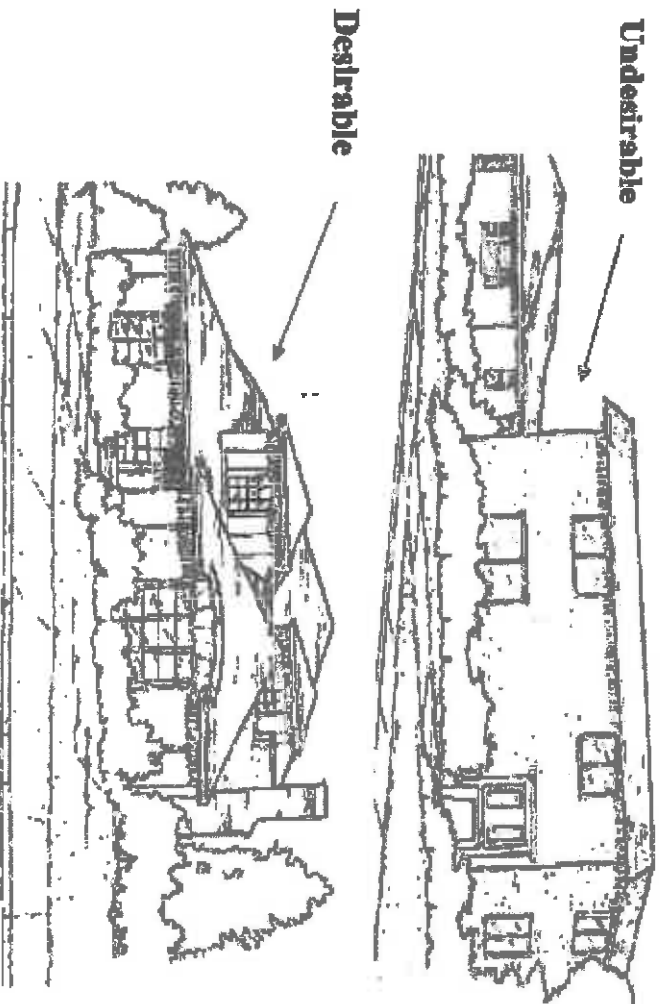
The design with two-story building walls in the original design appear too massive, and is far too plain and rectangular. The hipped dormers and projecting room elements in the design of the revised home assist in reducing its bulk.
